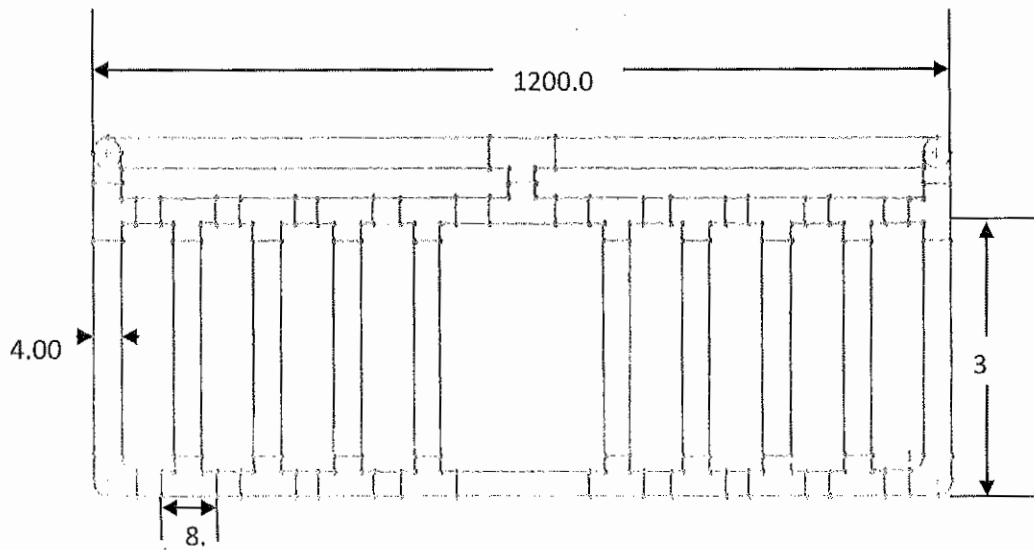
Cross-sectional view of the prototype floating wetland breakwaters showing the dimensions of the pipe ballasts.
